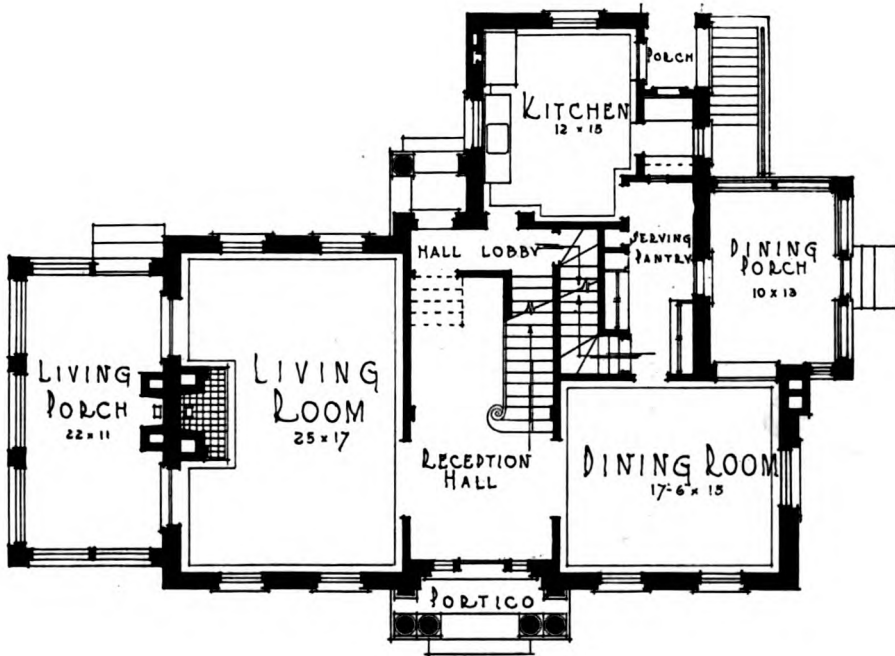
VIEW AND FIRST FLOOR PLAN—HOUSE AT GLENCOE, ILL. N. MAX DUNNING, ARCHITECT.
